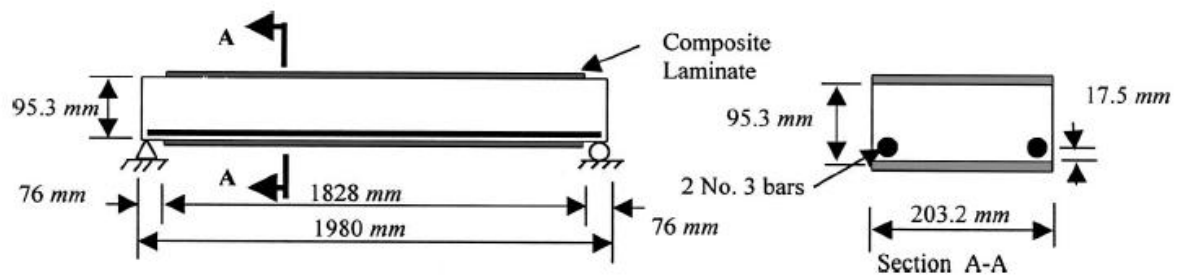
Beam dimensions and reinforcement layout (Tang and Saadatmanesh, 2003)
